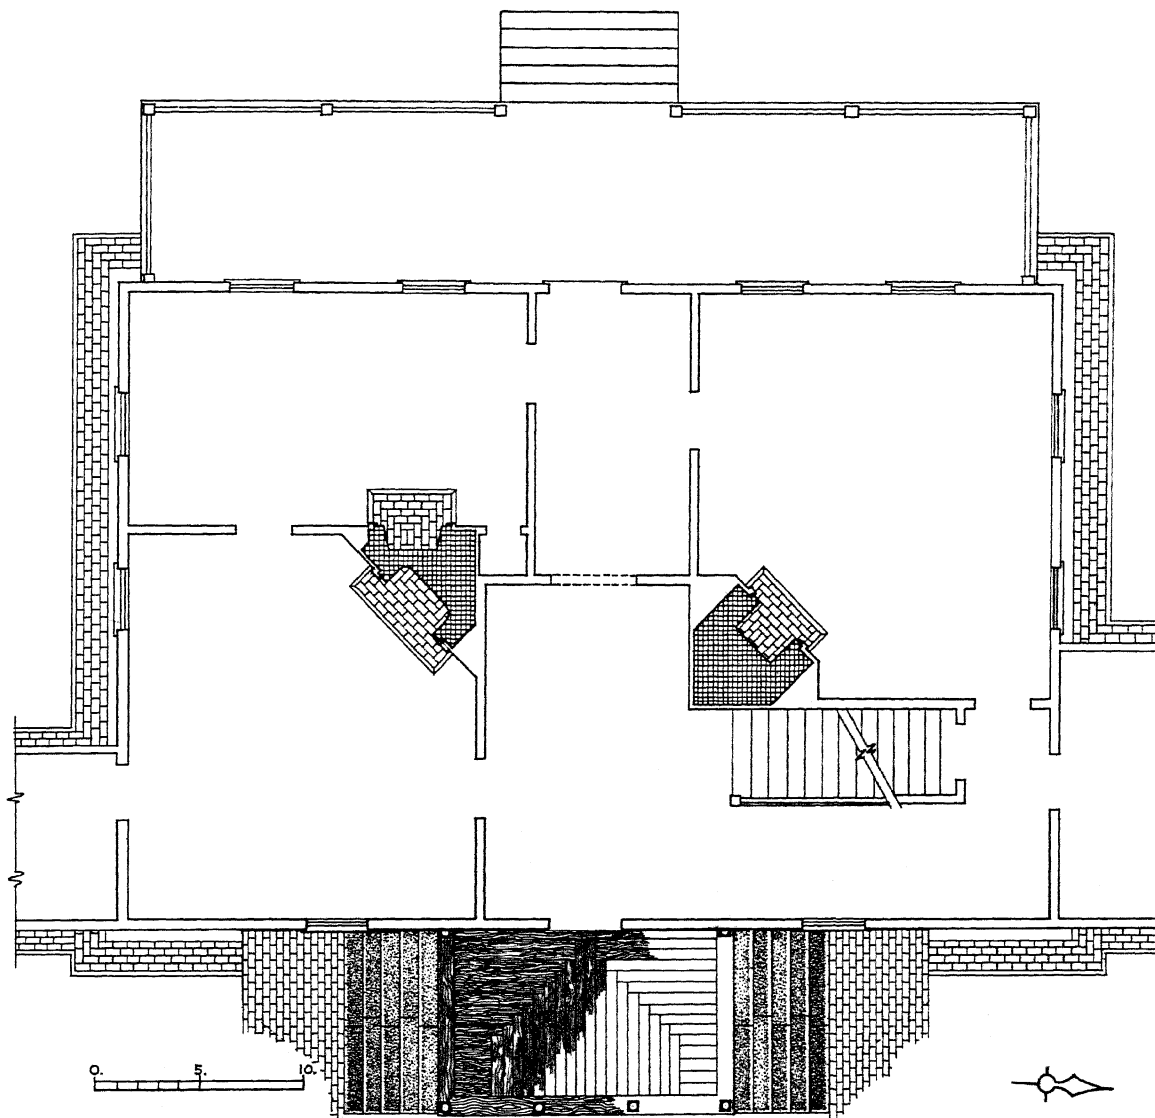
THE ROBERT CARTER HOUSE. Plan.
